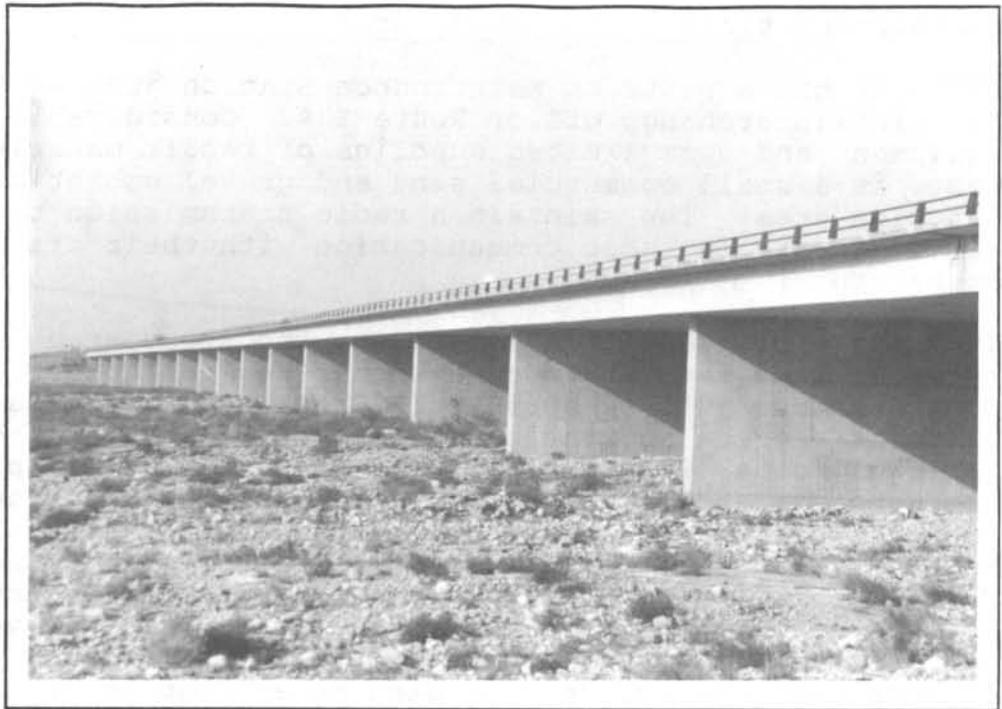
I-15 Bridge Over Lytle Creek Wash
